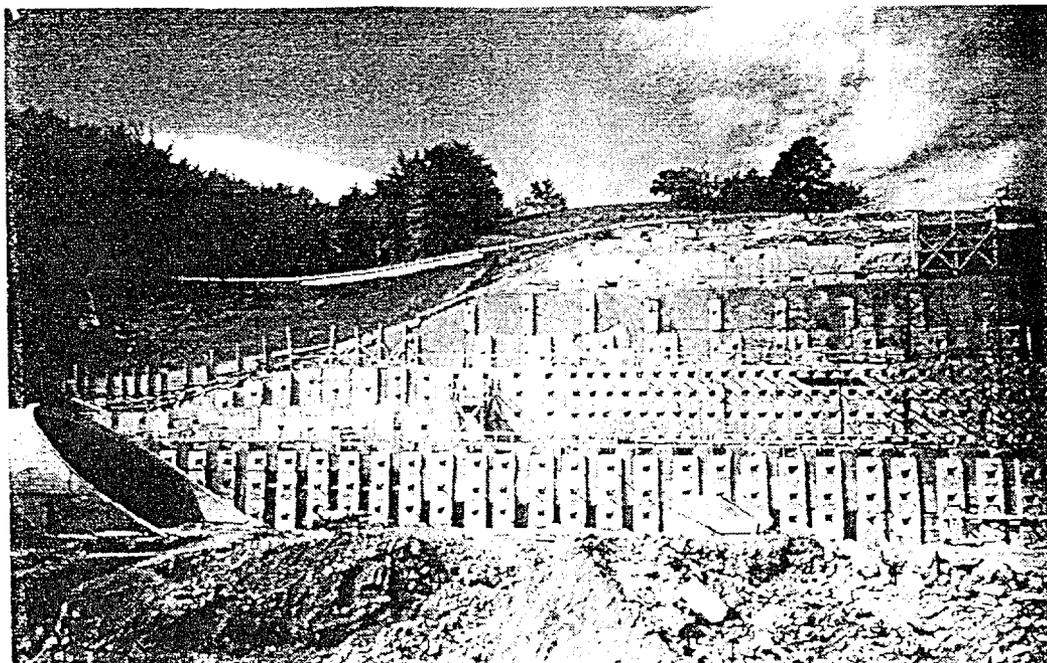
La Criblette landslide stabilized by prestressed anchors along A9 motorway near Lausanne.
